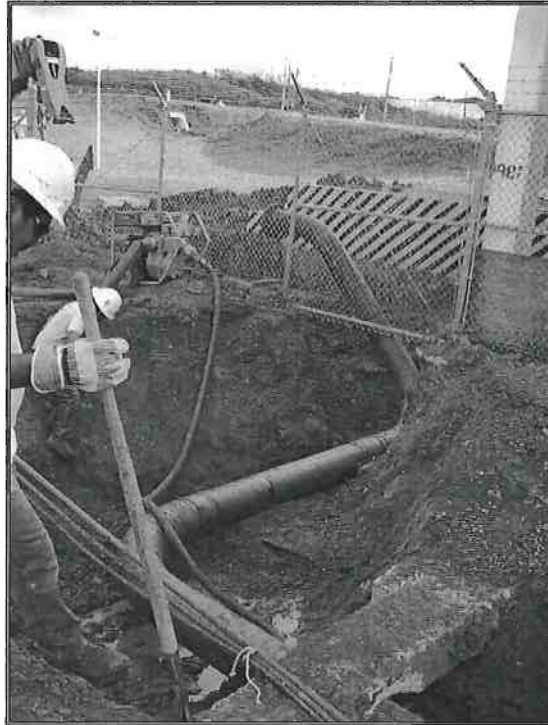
B – PH 1982 Pig Trap Installation JP-5 Pipeline
